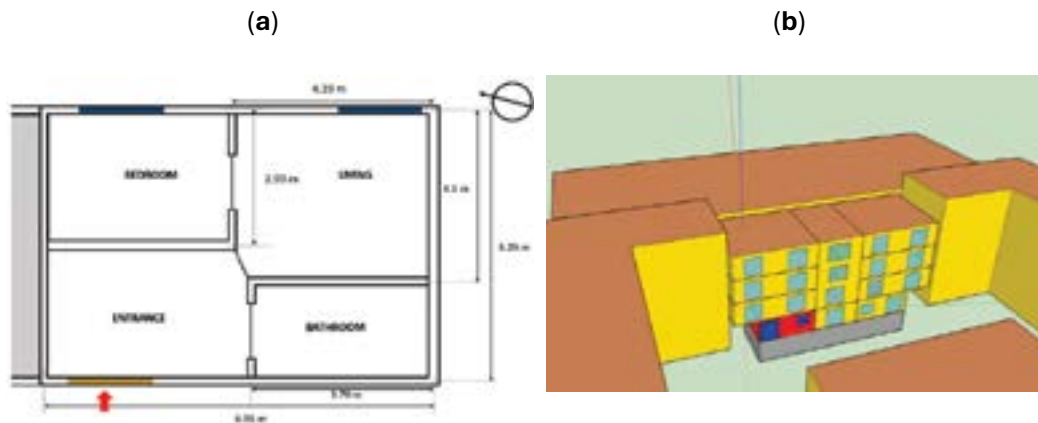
The layout of the apartment (a) and the position of the apartment in the building block: the analysed apartment is depicted in red, while the grey construction represents the underground garages (b).
